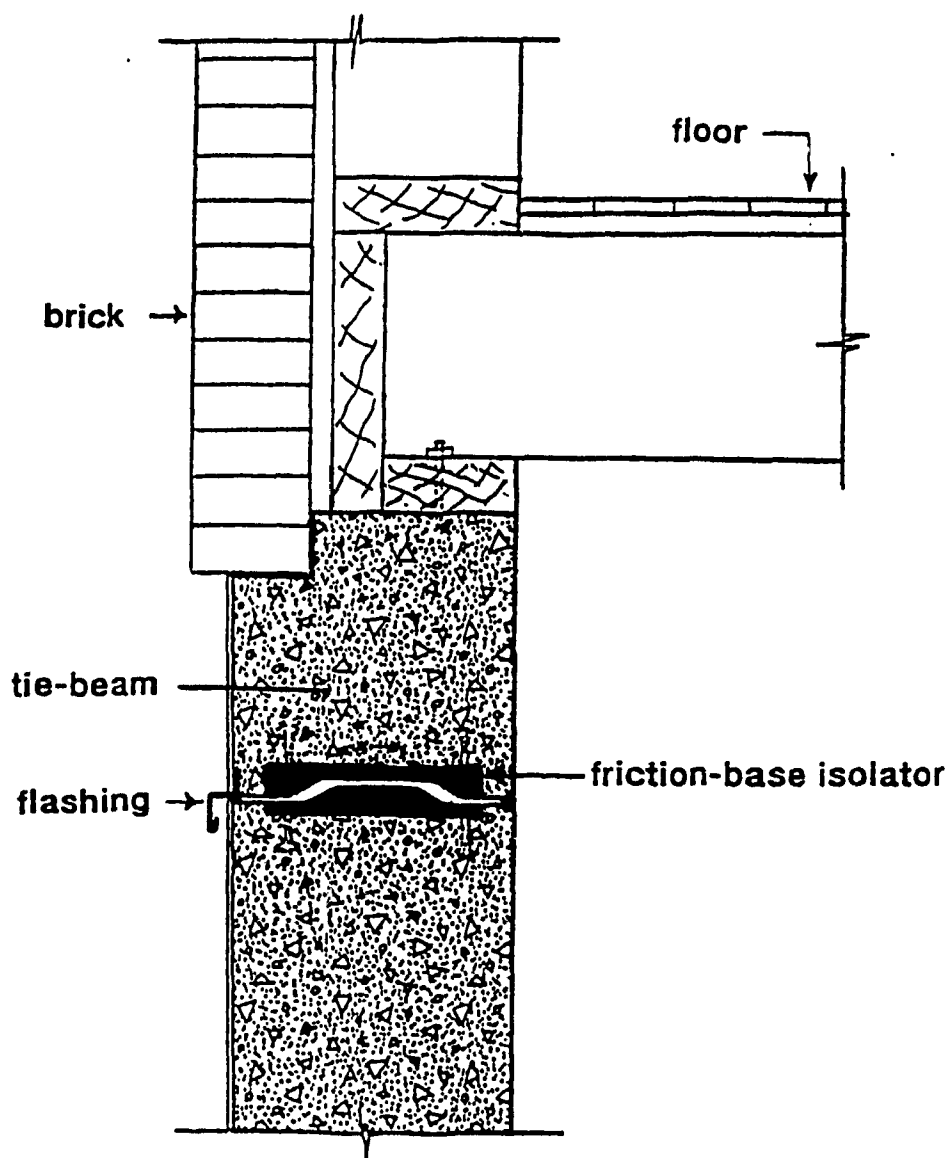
Friction Base Isolator - Section Through Foundation Wall
